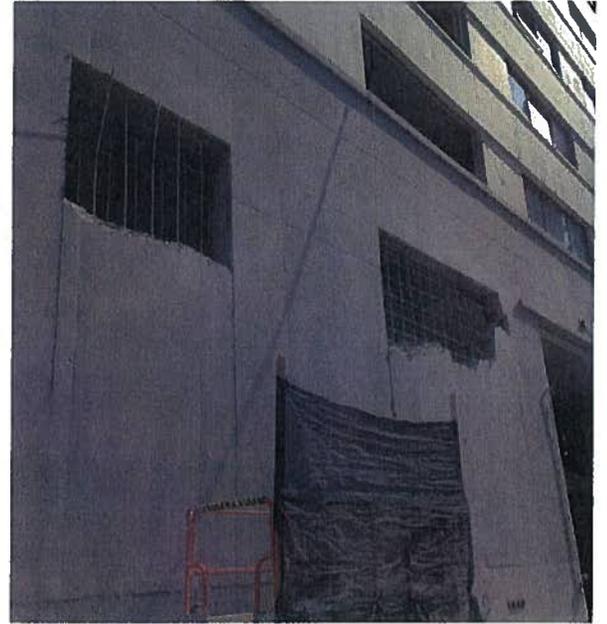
Corner of Rincon Place and Beale Street. These large window openings will bring light into the future retail space.
